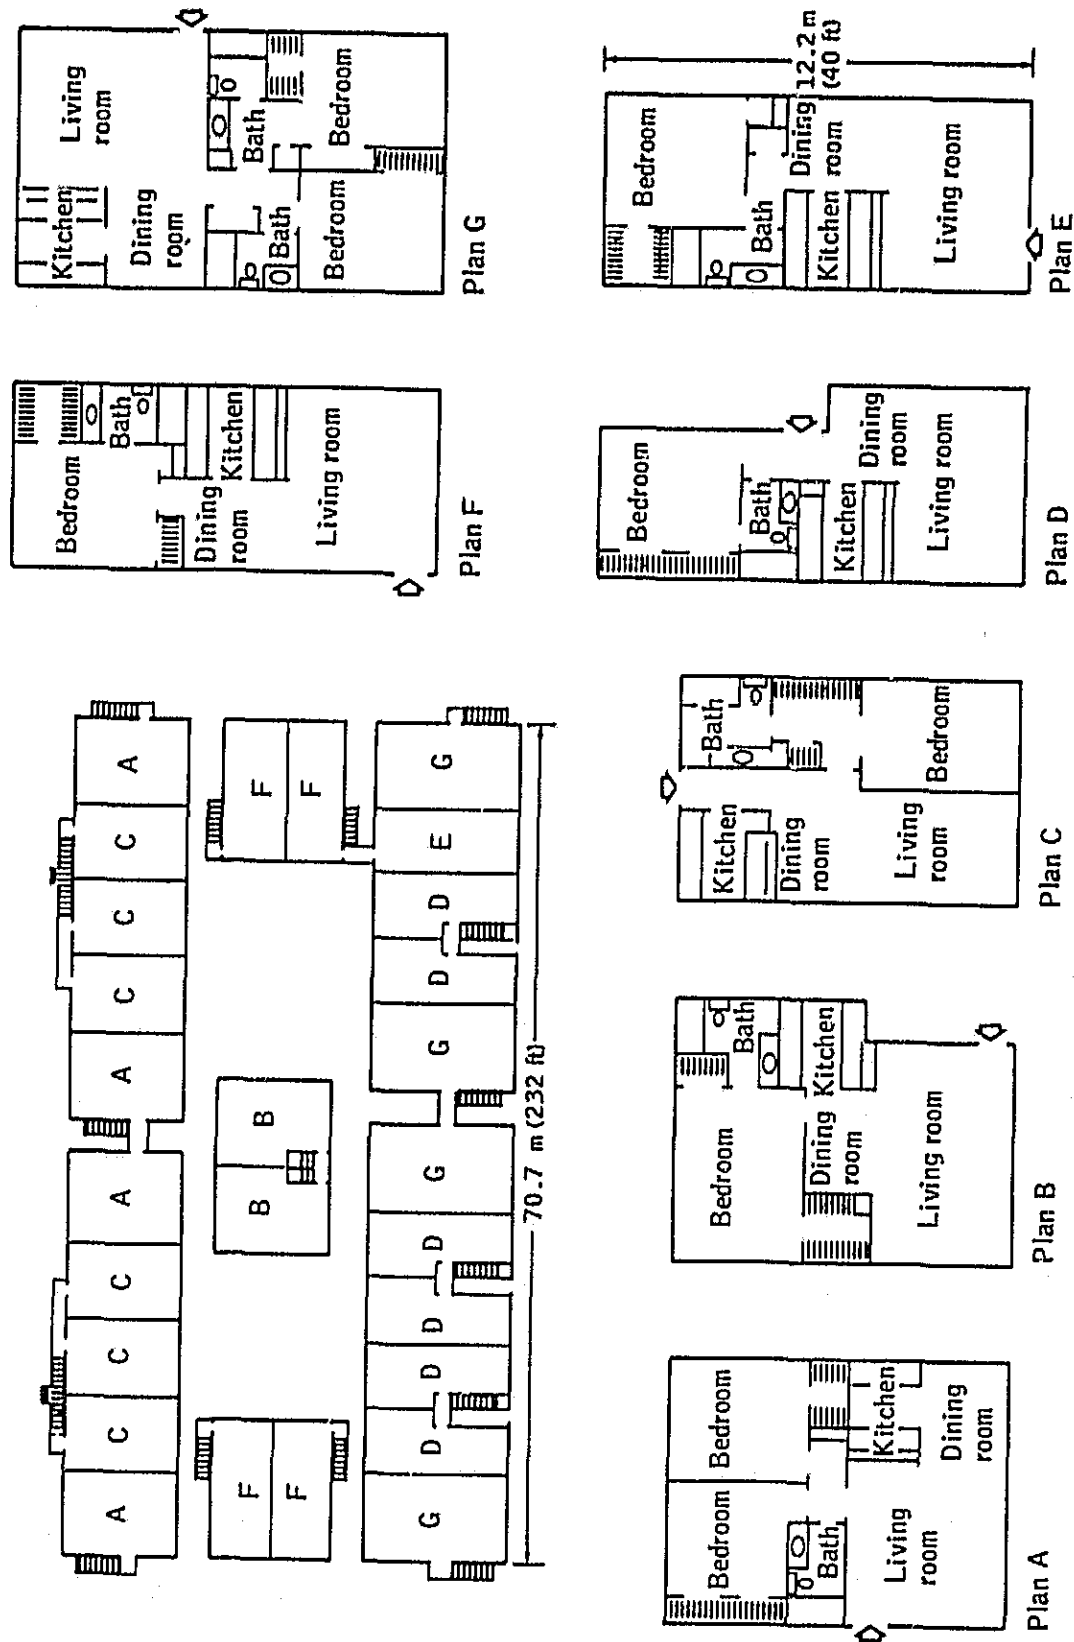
The 648-unit garden apartment module and floor plans, typical of apartment layouts in the Houston area.
